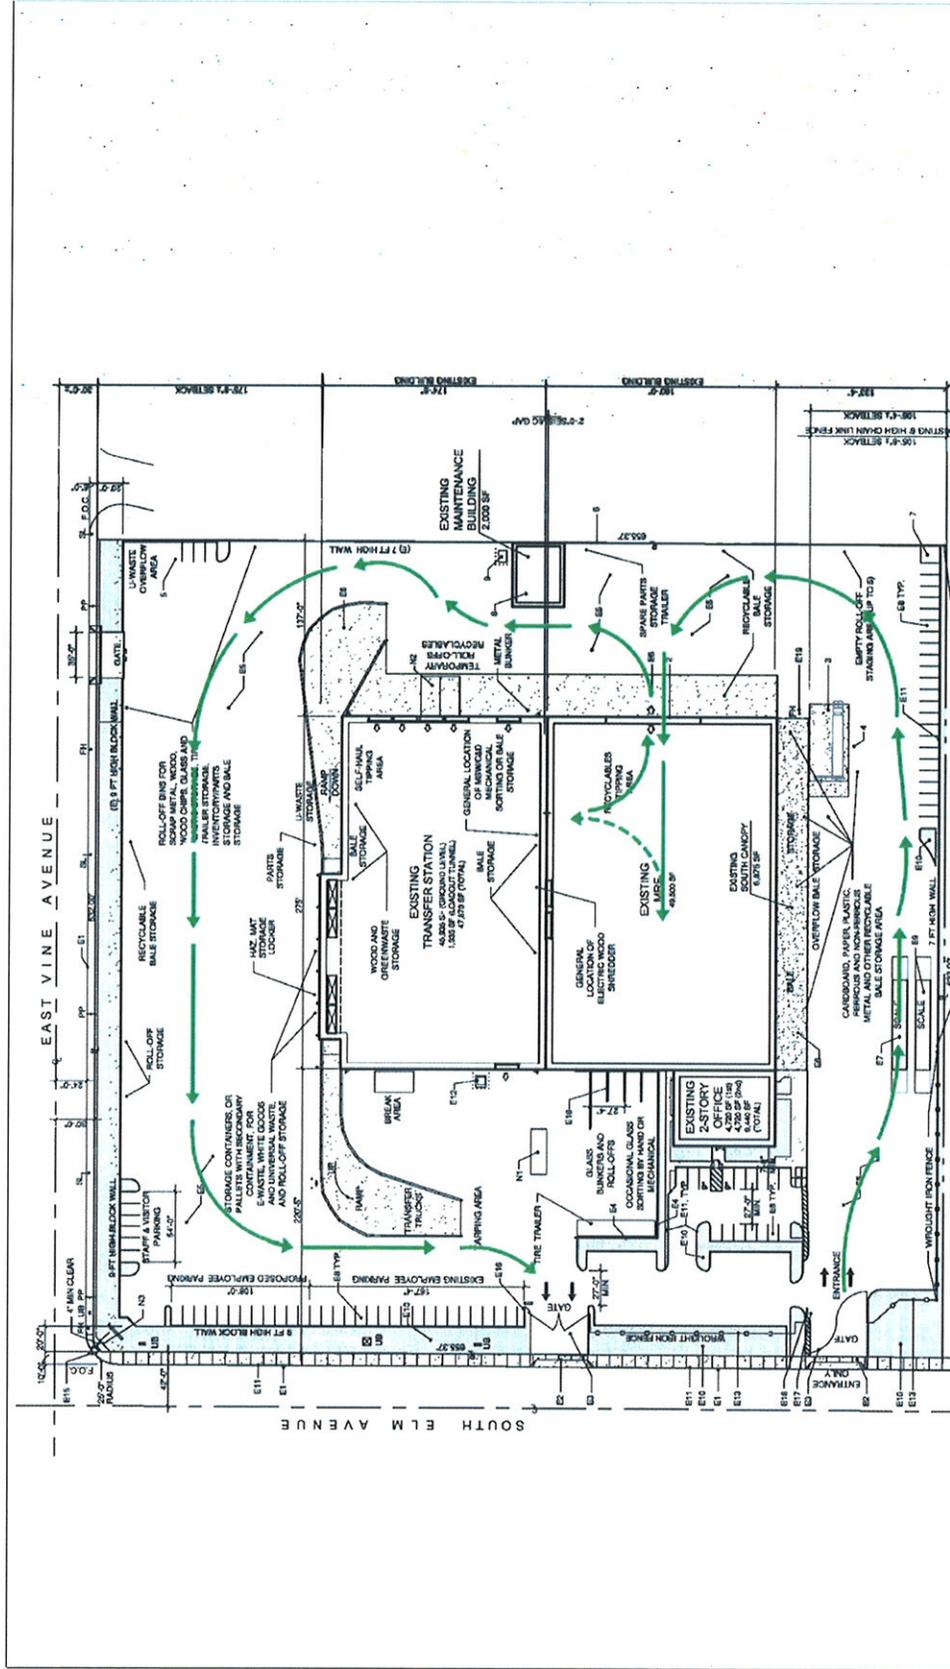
A: CURBSIDE RECYCLING TRUCKS ON-SITE CIRCULATION PLAN
